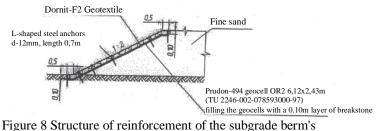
Structure of reinforcement of the subgrade berm's slope of the North Caucasian railroad
